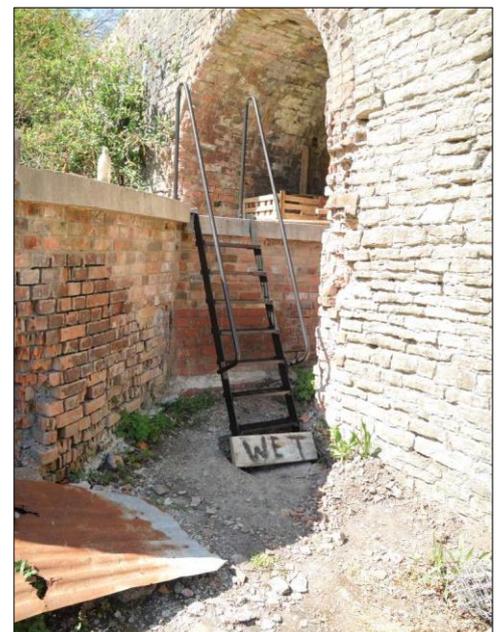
Steps leading up to the woodstore on top of the fan ducts.
